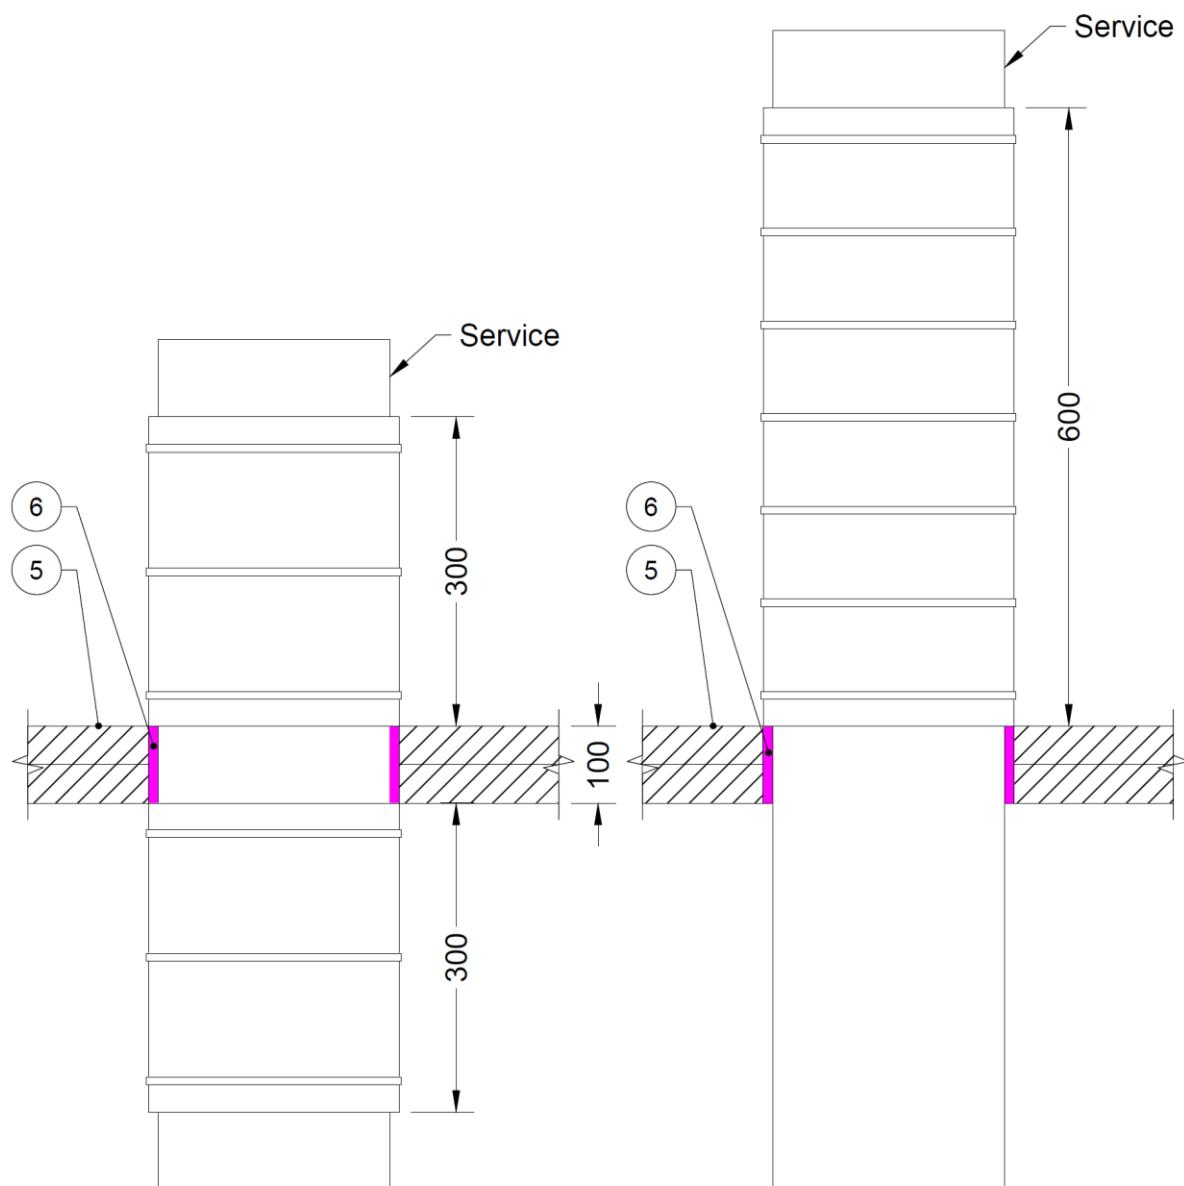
Section View of Steel Pipes ( $\varnothing 41$ - $\varnothing 300$ mm) Installed in Horizontal Substrates
